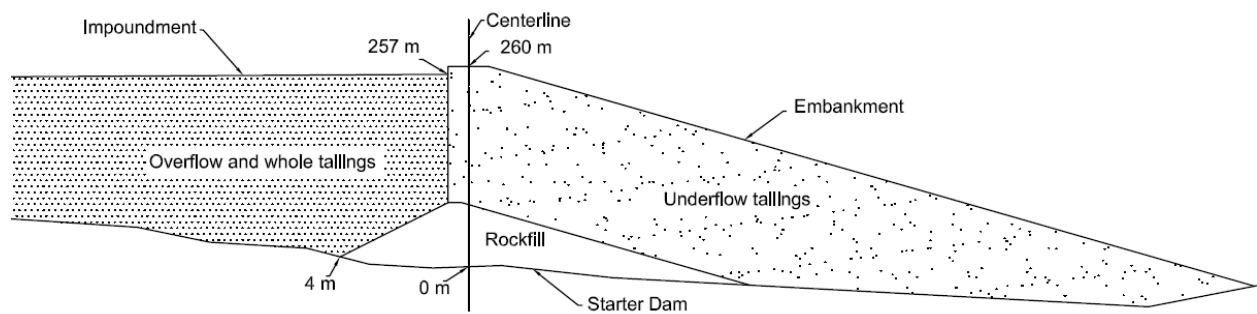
Typical cross-section of the centerline embankment dam for the full-scale tailings storage facility case study; maximum embankment height = 260 m (at centerline) and maximum tailings impoundment height = 253 m. The impoundment contains overflow tailings, which are the finer fraction after cycloning, and whole tailings, which are bulk tailings discharged directly from the concentrator plant without cycloning. The embankment is built from the coarse fraction after cycloning (underflow tailings).
